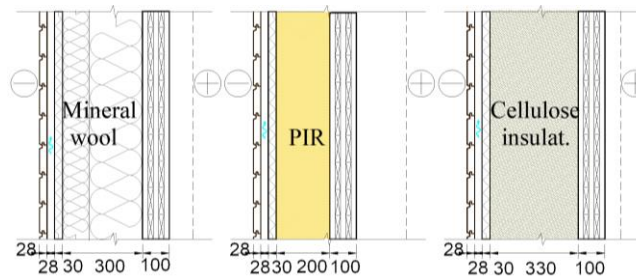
Cross-sections of CLT external test wall types from which air leakages were measured.
